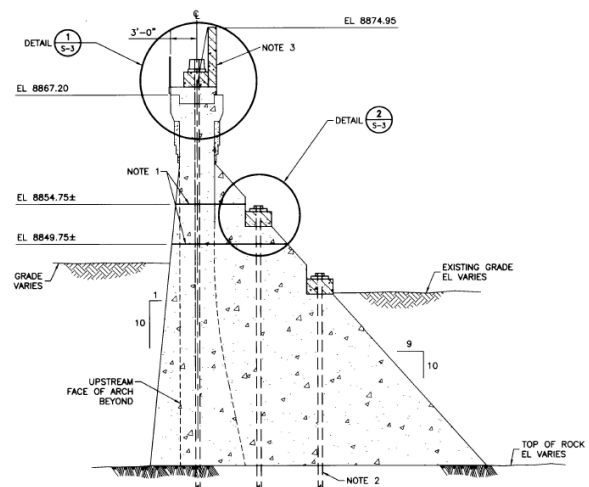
Detail of Plan for Anchors through Right Abutment Arch and Gravity Sections
